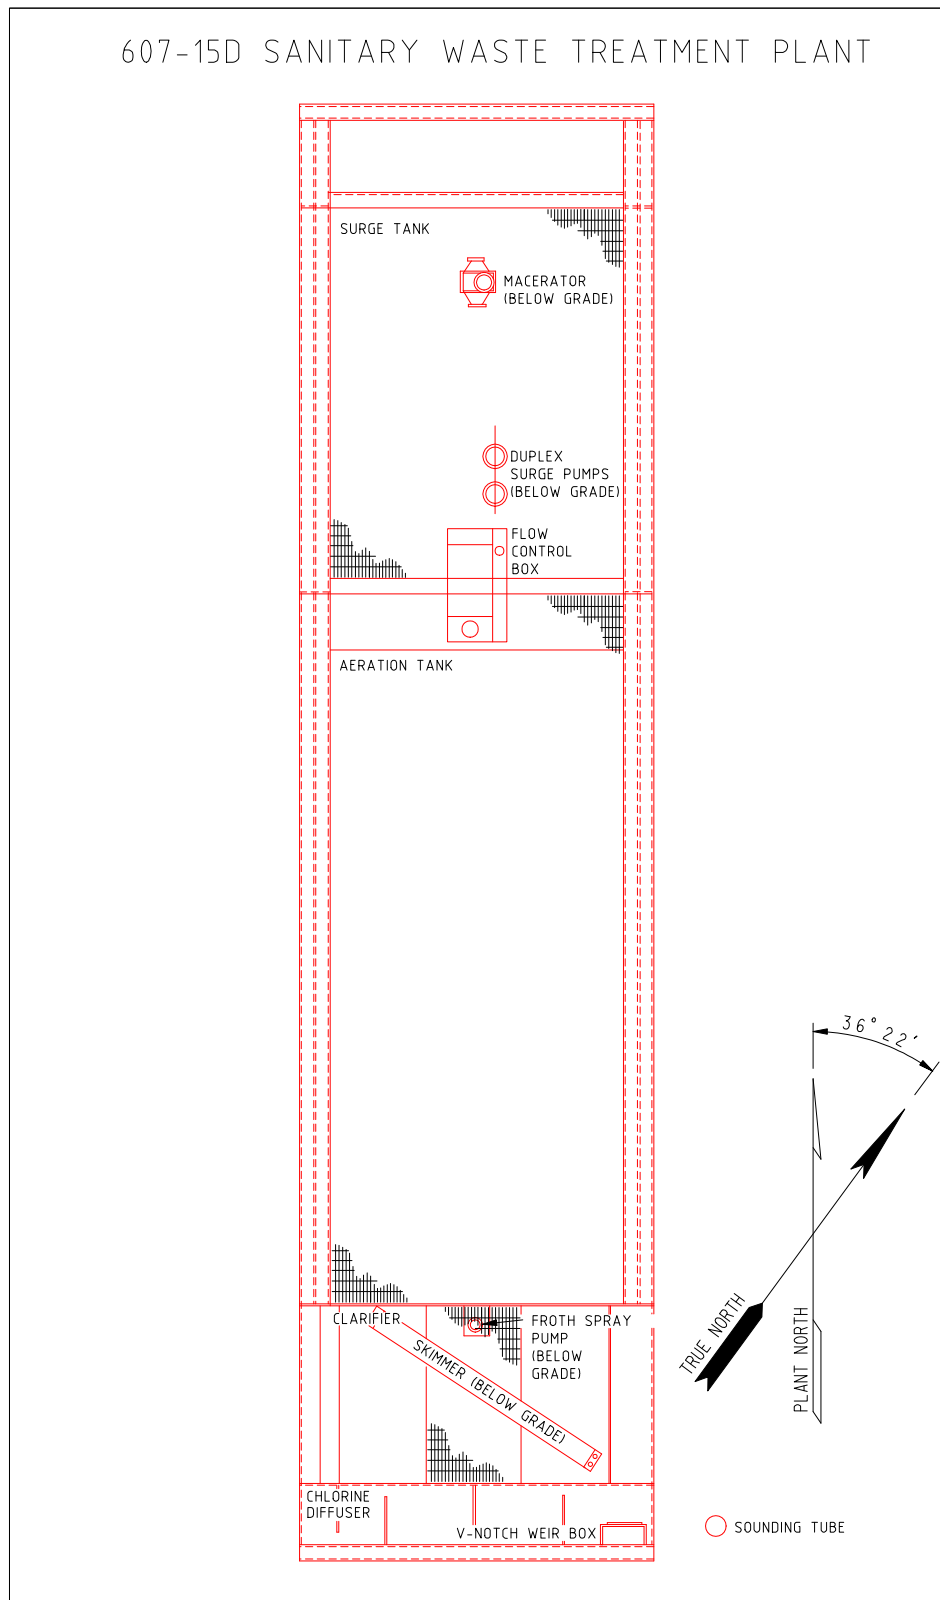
Building 607-15D, Sanitary Waste Treatment Plant
